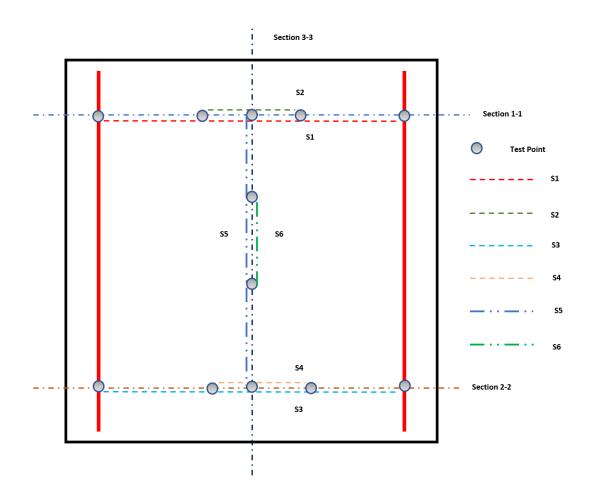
Electrical safety evaluation plan for laboratory-scale ECON slab
